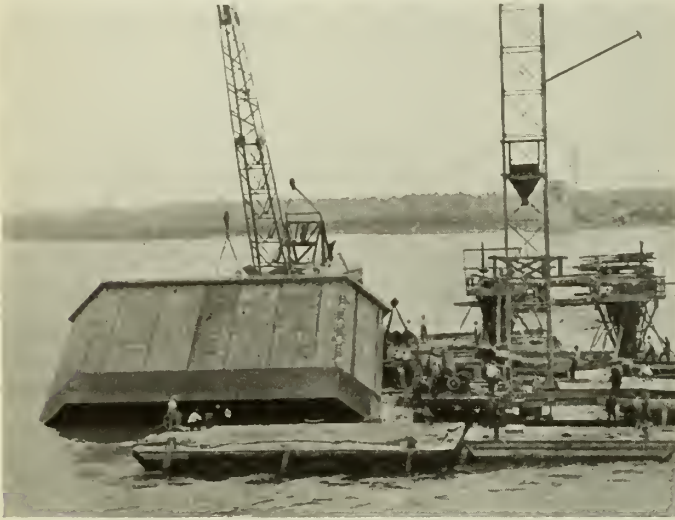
Masson lifting Caisson No. 9 at Pier Site.
